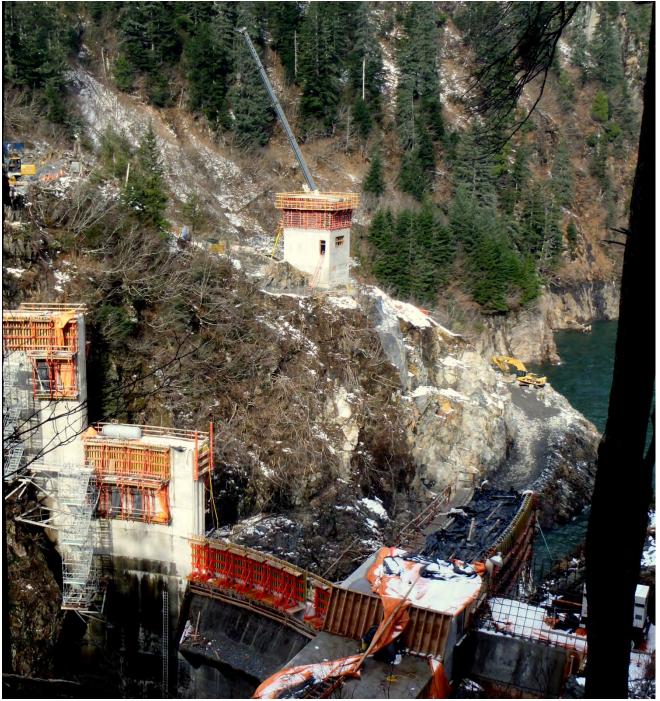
Intake Portal and Right Abutment, Barnard scaled intake portal to completed intake portal excavation.
